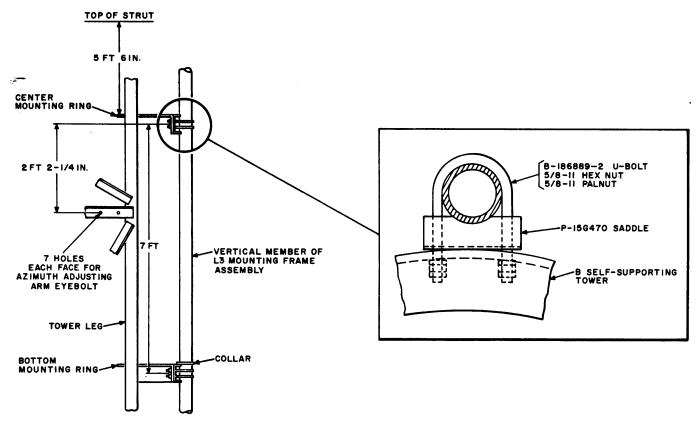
Antenna Installation on AT-7729 B Self-Supporting Tower
